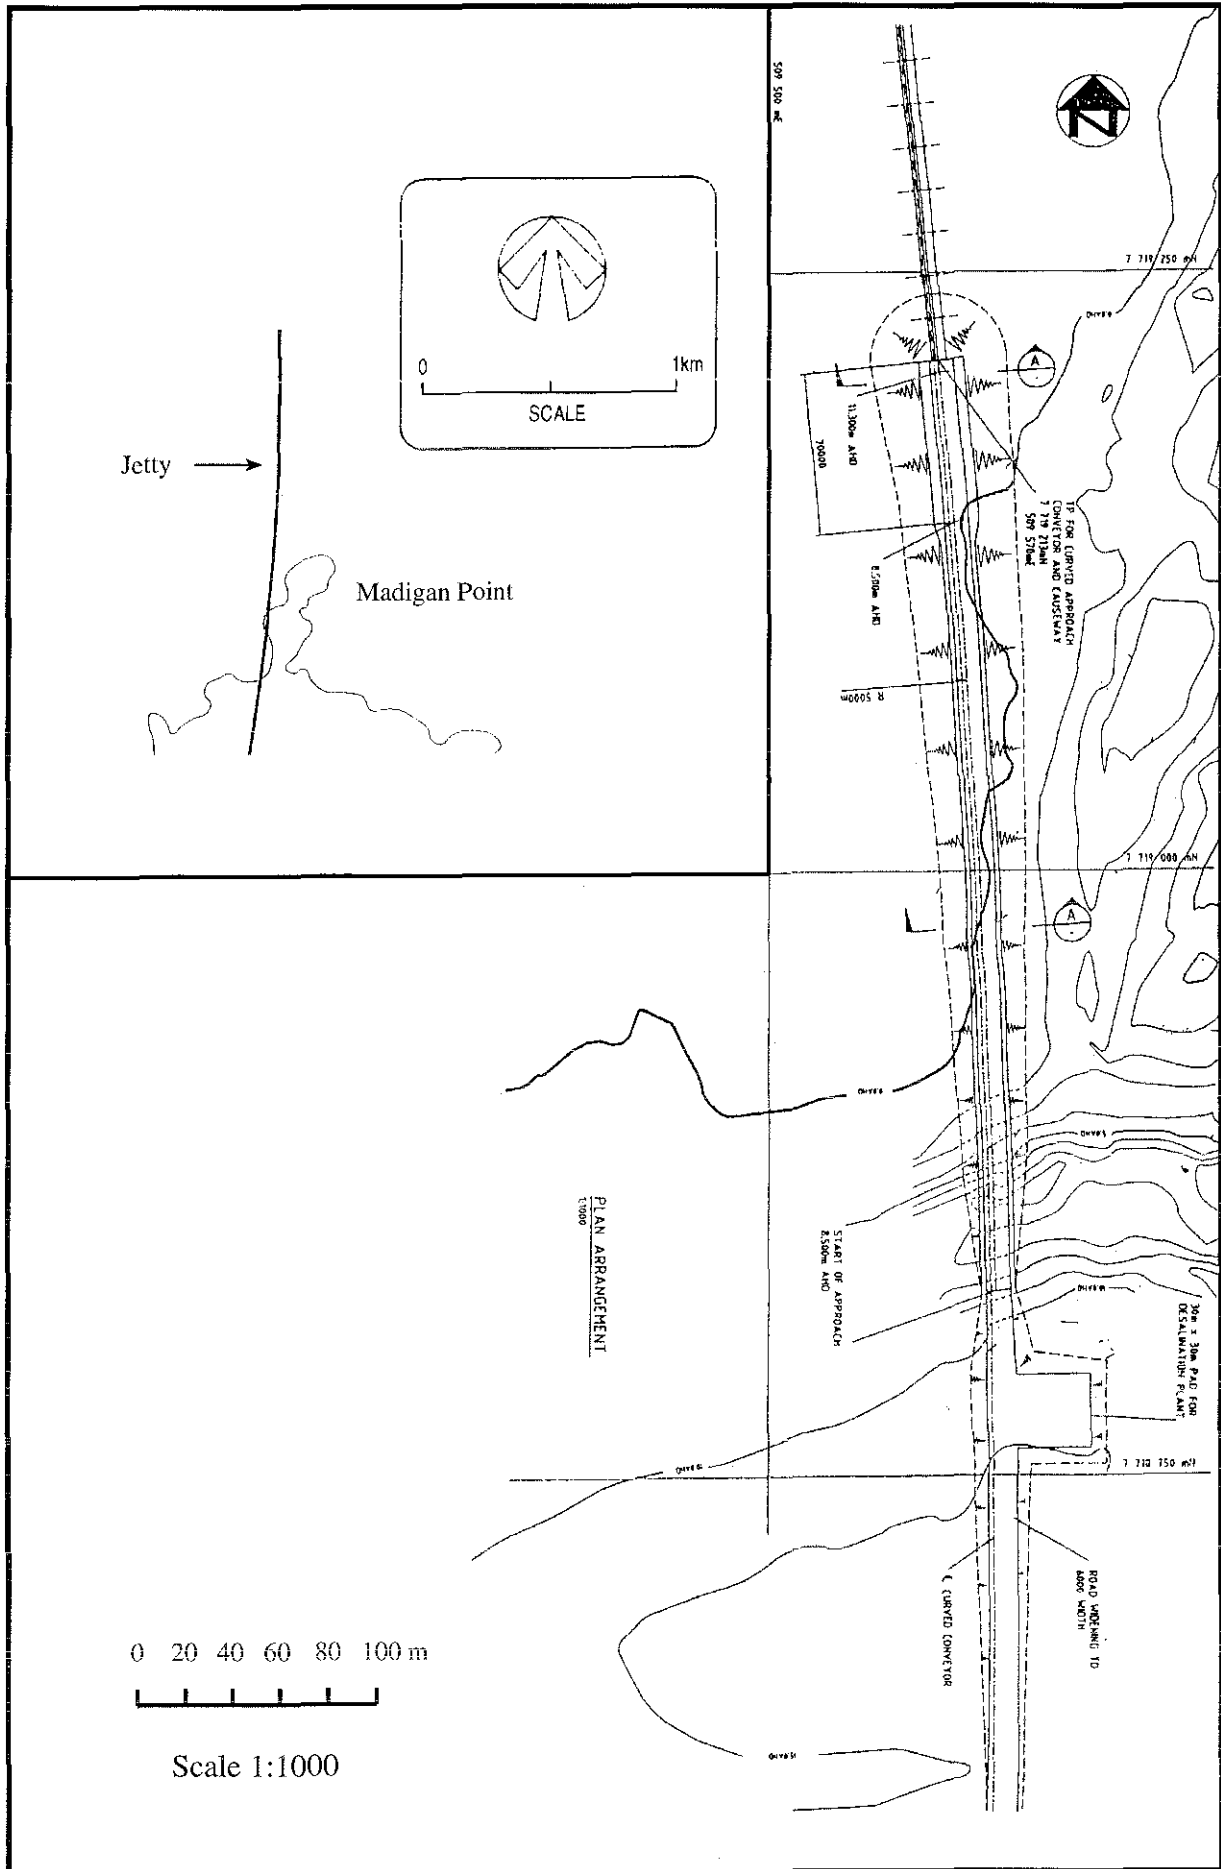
Proposed loading jetty and causeway junction - Madigan Point. (Source: Australian United Steel Industry P/L - preliminary design drawing)
